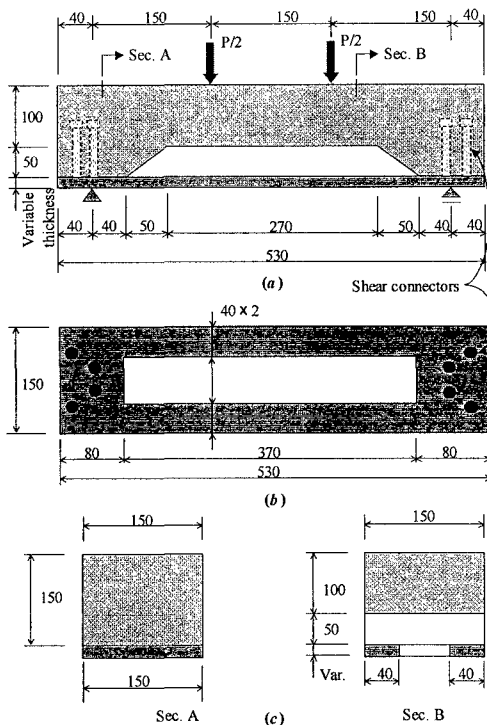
Details of the specimens: (a) front view, (b) steel straps (upper view before casting), and (c) sections. Units are in mm.
